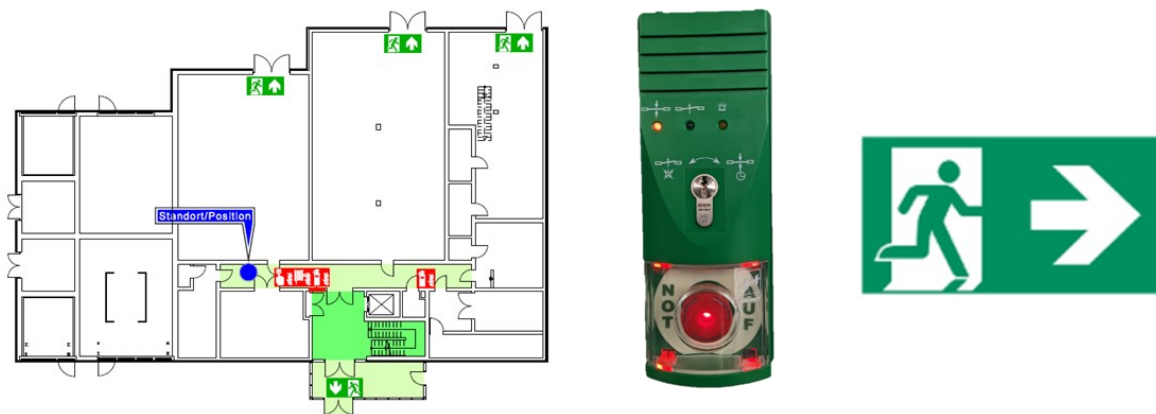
Diagram of the escape and emergency plans, escape route control terminal, escape route sign
